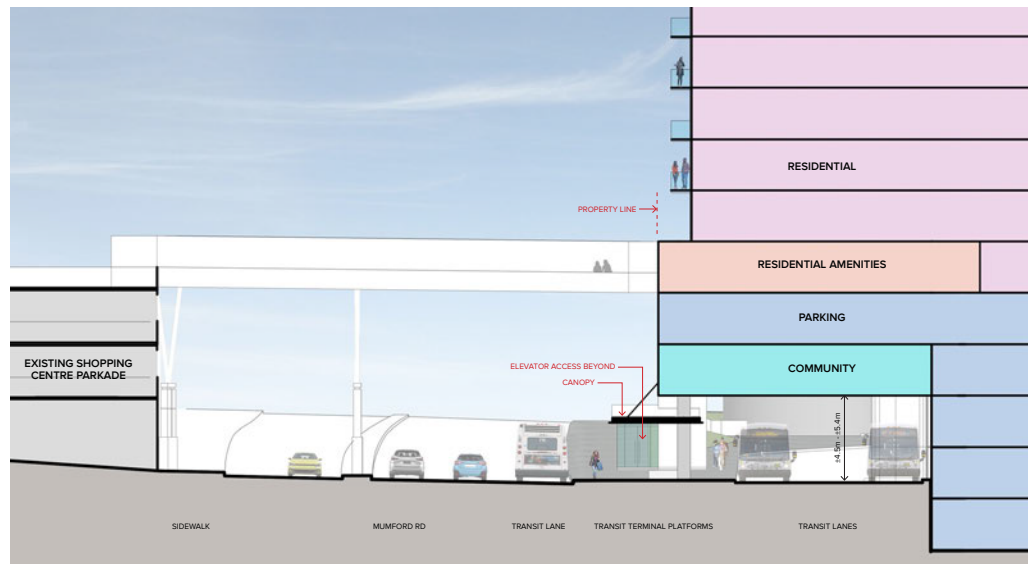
Cross-section showing building design over the Mumford transit terminal.
